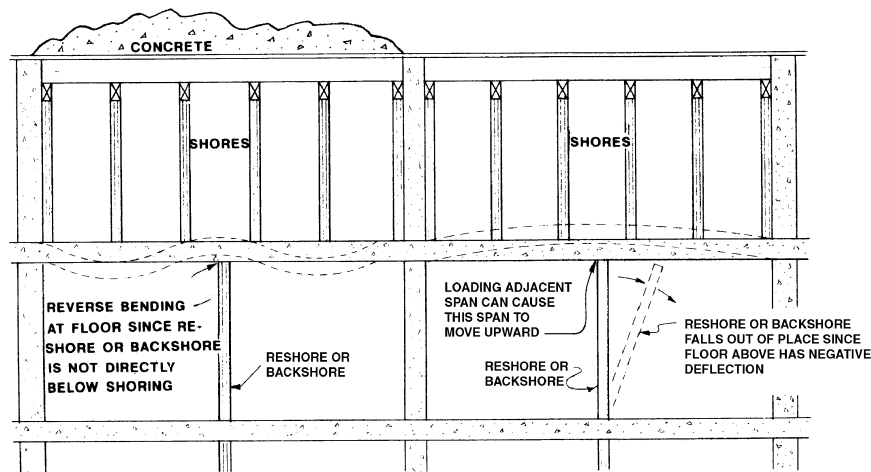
Reshore installation. Improper positioning of shore from floor to floor can create bending stresses for which the slab was not designed.
